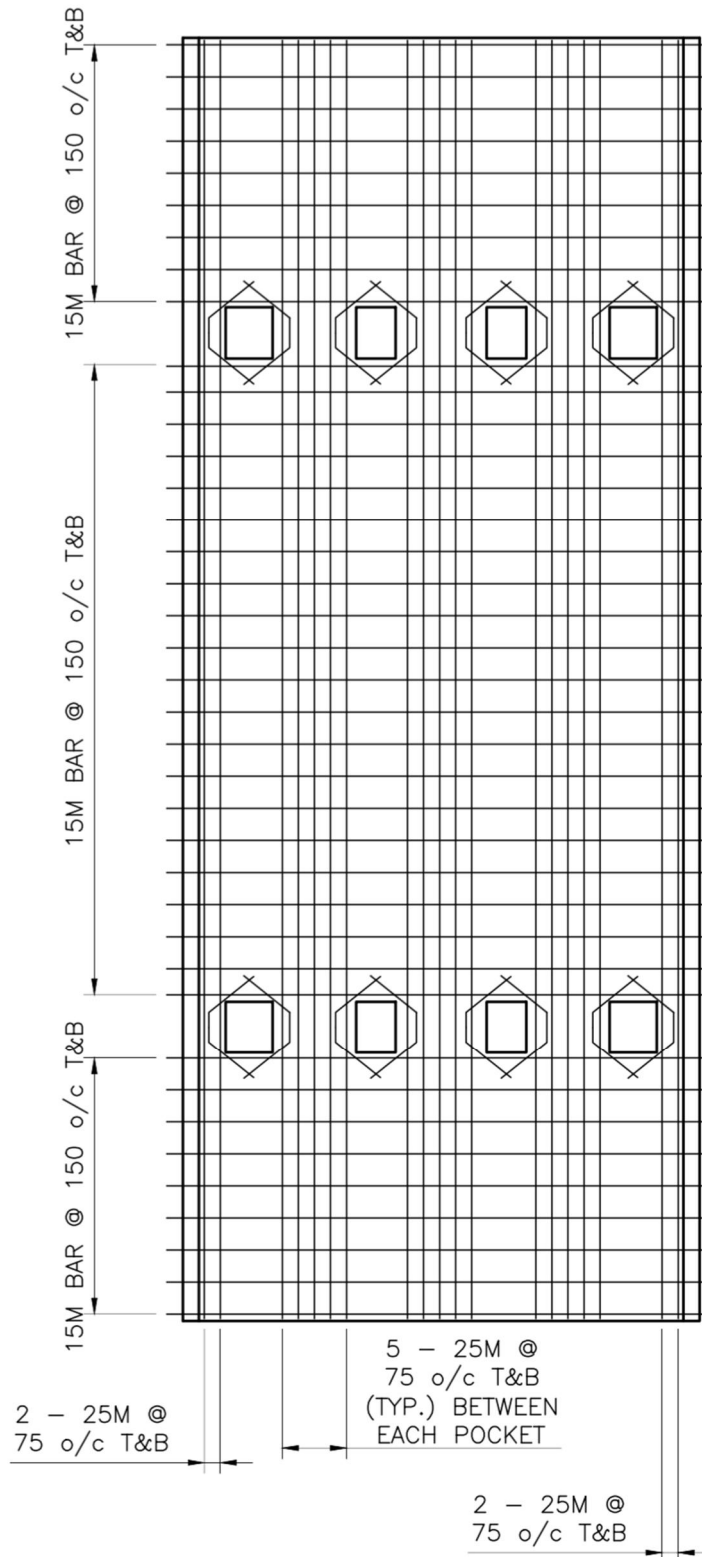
Typical PPCP Steel Reinforcement Layout (Plan View)
